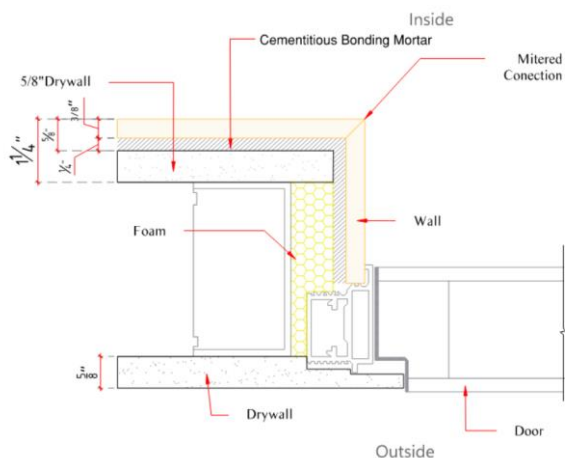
Stone Wall Opening/Return Detail Showing Mitered Edge Condition and Controlled Wall Build-Up at the Door Interface
